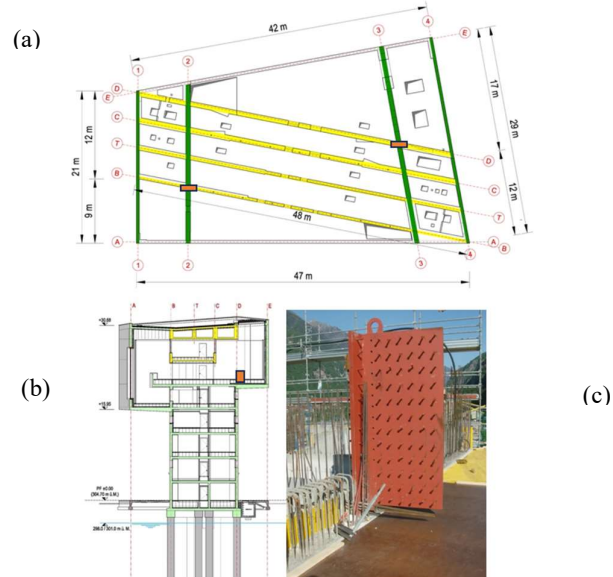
Upper box structural scheme (a), structure vertical section (b) showing steel connection flag positions and picture (c)
